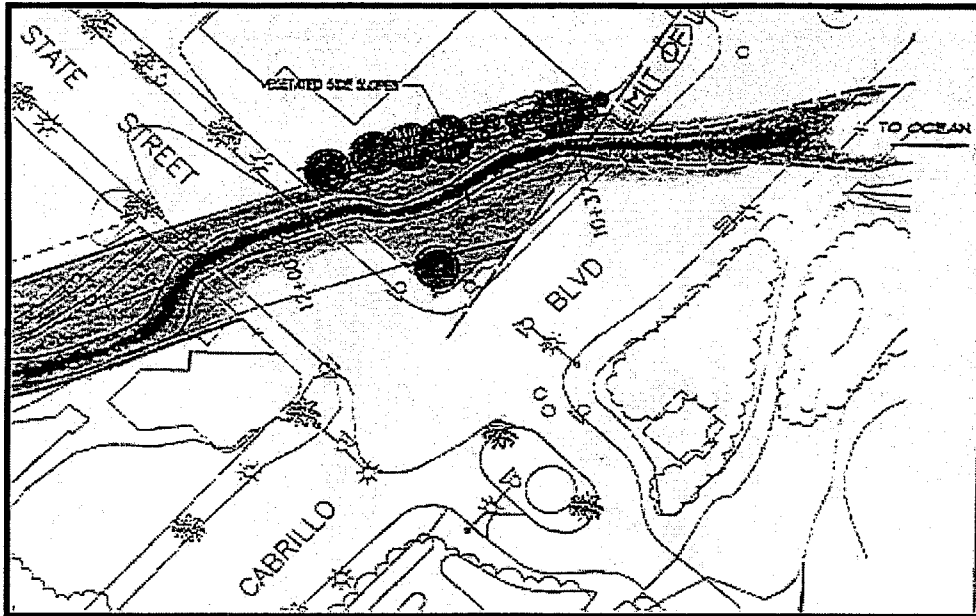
State Street Bridge to Cabrillo Boulevard Bridge
